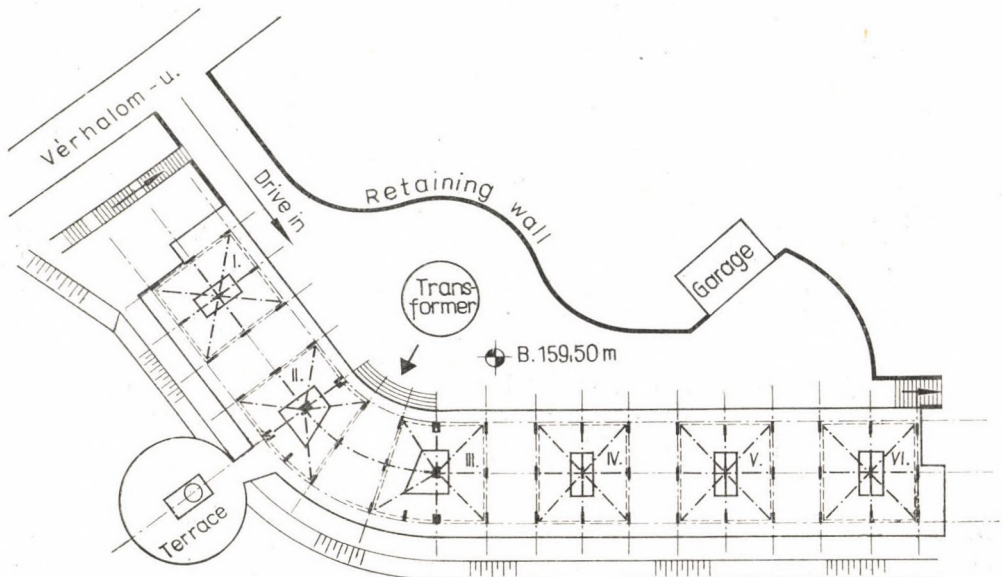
Plan of the hotel building showing the arrangement of columns and foundations
